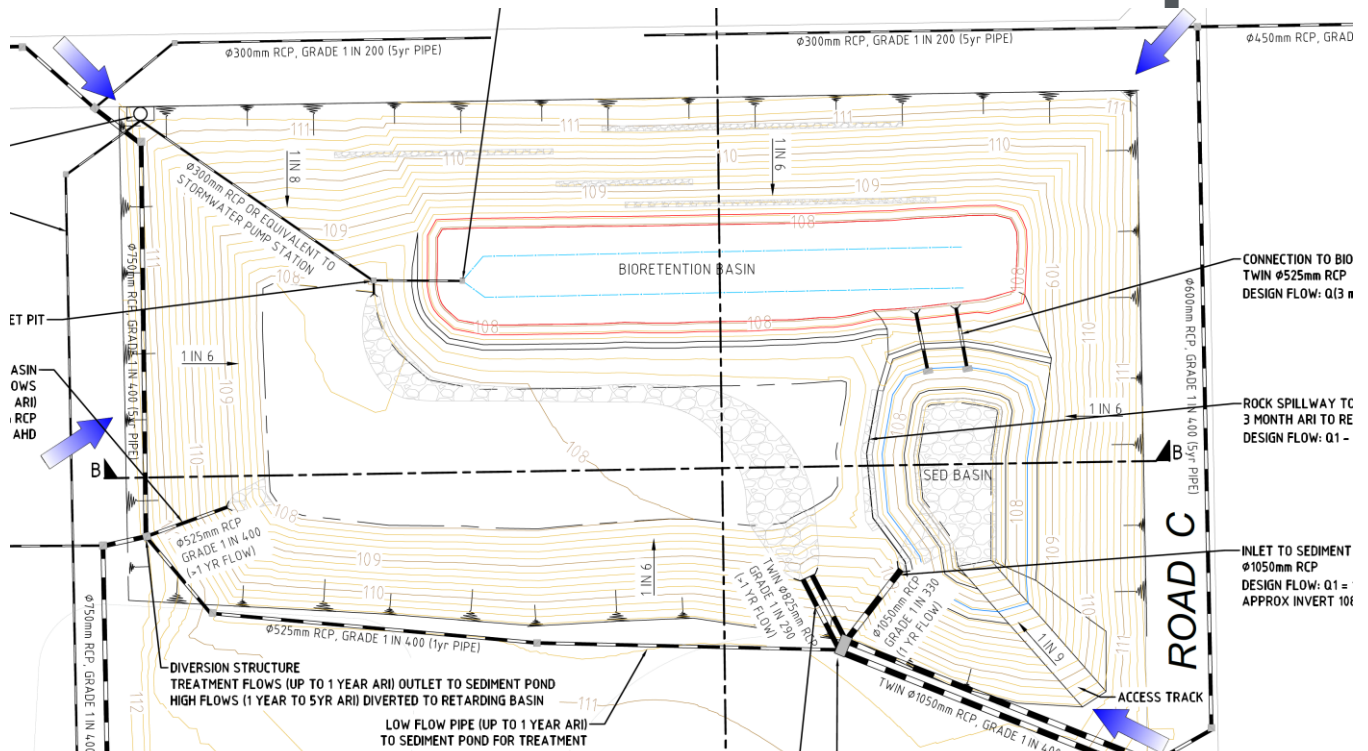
Reeds Consulting Catchment 1 Functional Design Plan.
